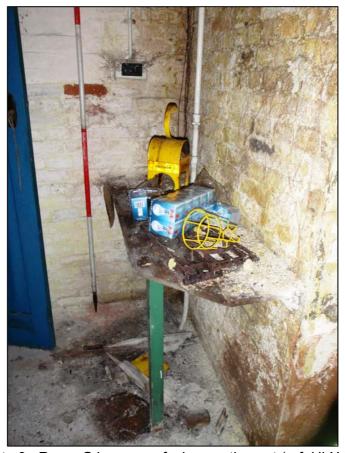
Room G4, camera facing south-west (ref. HLX 21)
